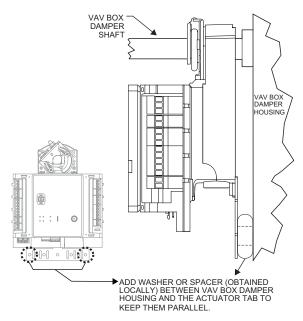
Mounting Controller to VAV box damper housing when actuator is not parallel to VAV box damper housing
